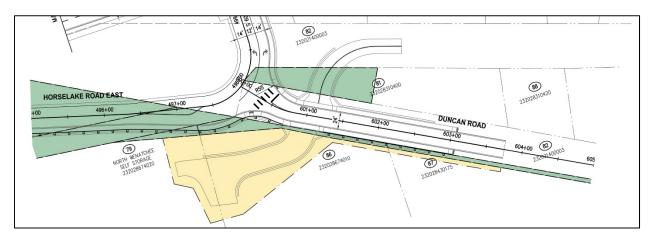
Property Impacts: Horselake Road East Extension and Duncan Road Extension
